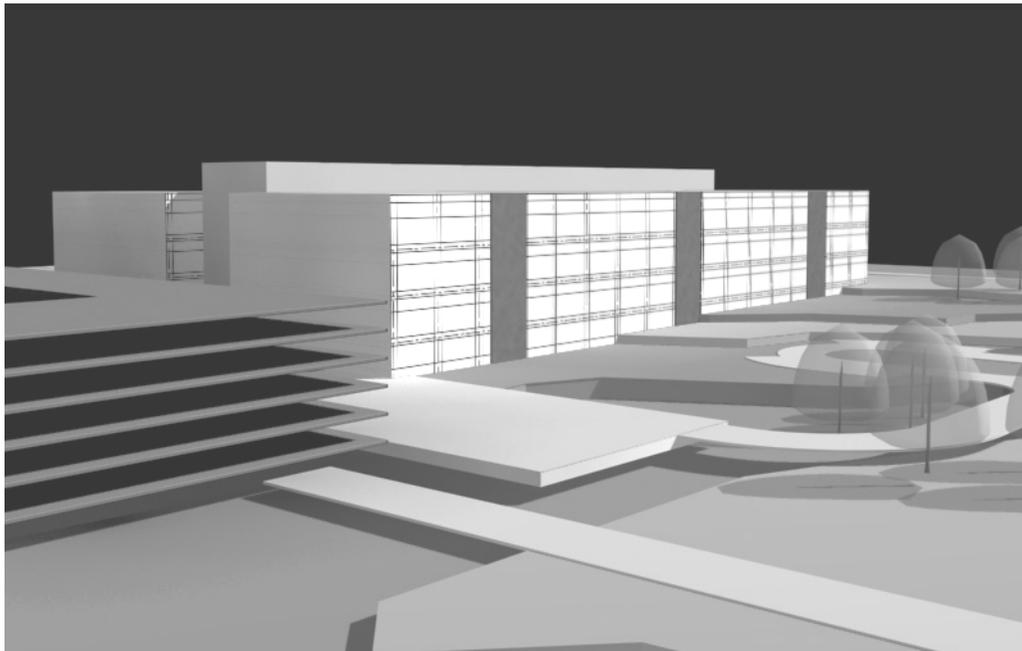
Computer rendering of proposed new facility (right) and parking garage (left)
